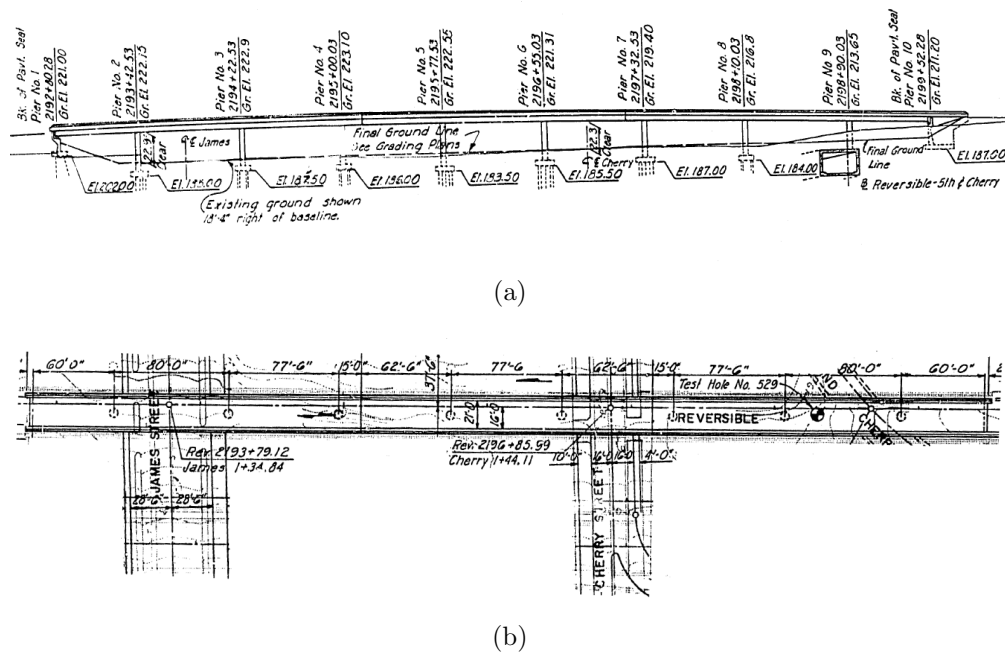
Bridge 2 in (a) elevation and (b) plan view
